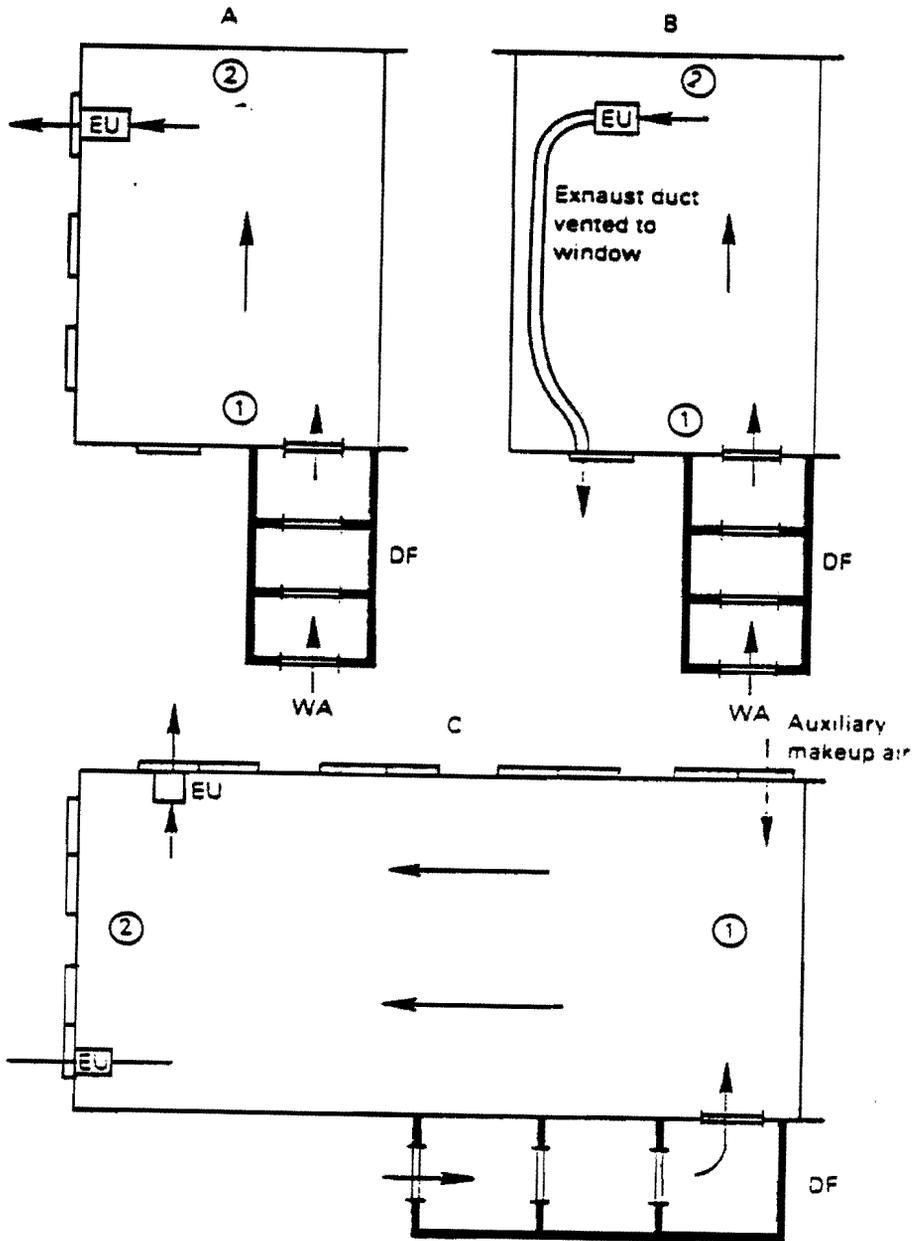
Examples of negative pressure systems. DF, Decontamination Facility; EU, Exhaust Unit; WA, Worker Access; A, Single-room area with multiple windows; B, Single-room work area with single window near entrance; C, Large single-room work area with windows and auxiliary makeup air source (dotted arrow). Arrows denote direction of air flow. Circled numbers indicate progression of removal sequence.
